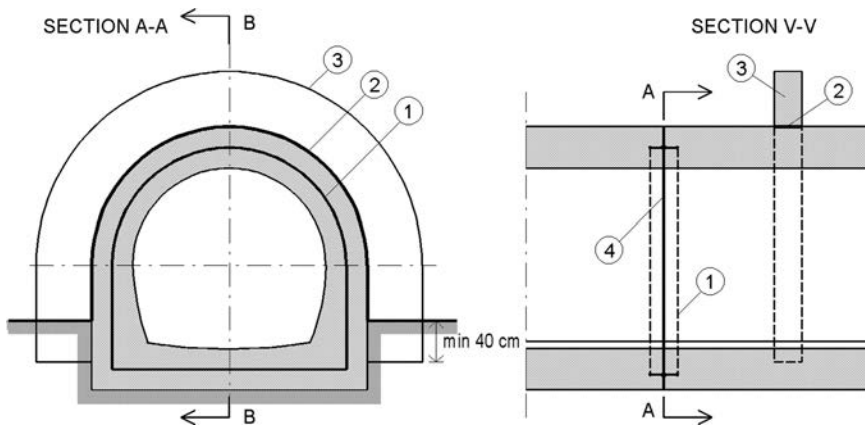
Reinforced concrete water-conveyance gallery. (1) Rubber waterstop seal; (2) waterproofing; (3) reinforced concrete cutoff collar; (4) joint.
